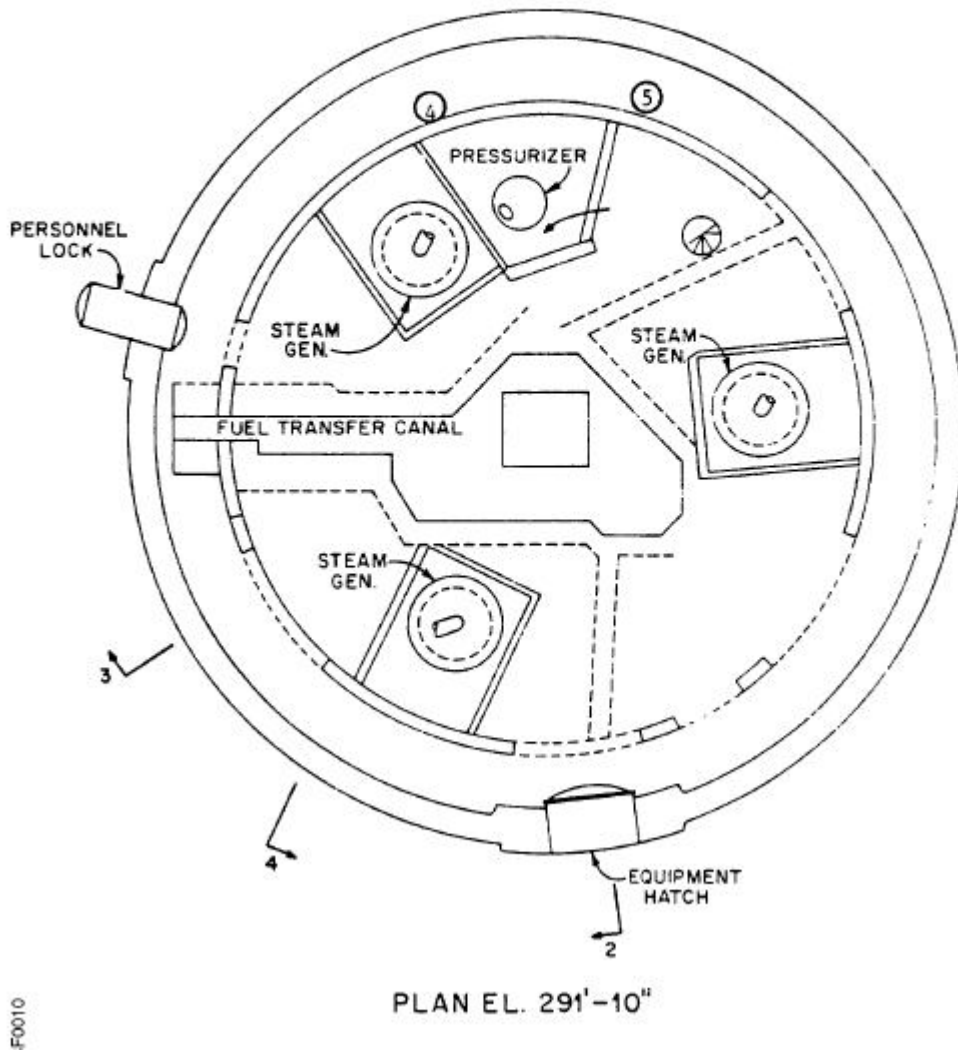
Cross-sectional top view of containment structure from elevation of 291' 10", showing locations of walls, subcompartments, and major equipment [33]. Copyright Dominion Power; Used with permission.
